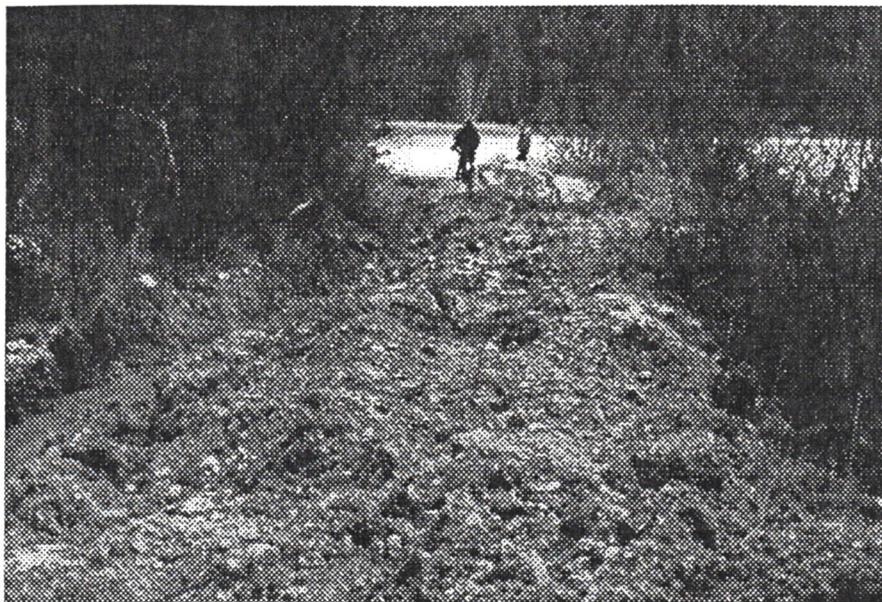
Road bed after unauthorized construction. (Photo by Dale Pier, FWP)
